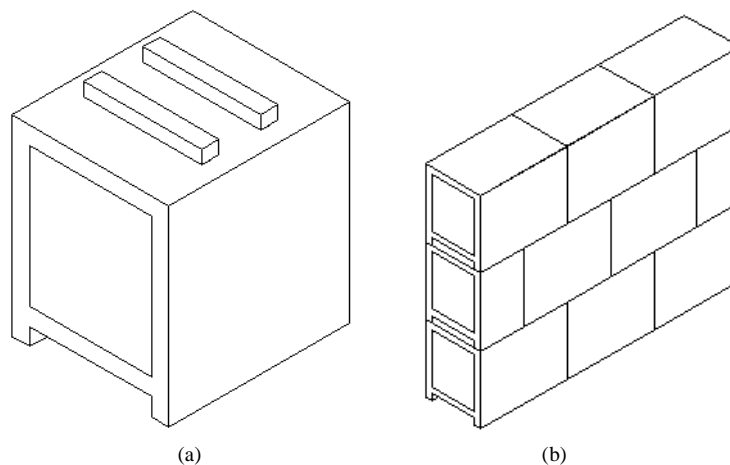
New types of blocks and masonry forms. (a) New block, (b) New block masonry
